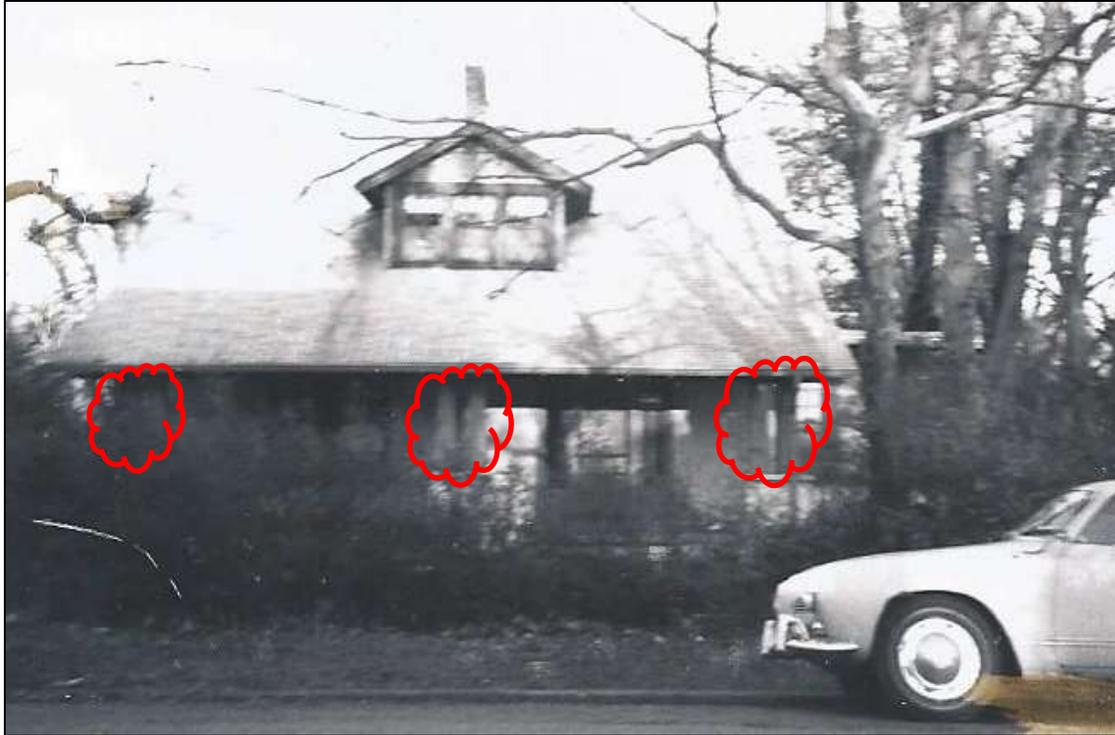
Historic photograph shows the porch columns had paired wood columns and stone pedestals
